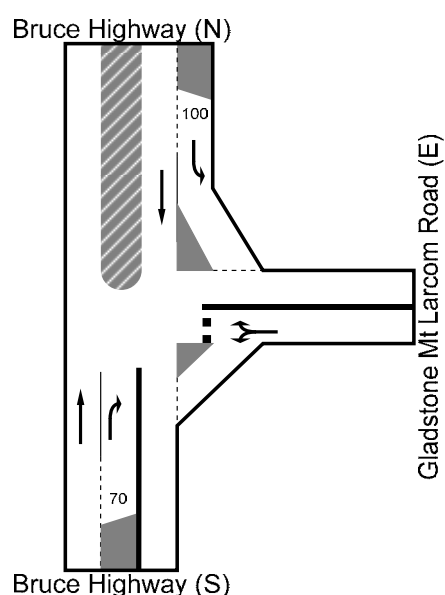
Existing Bruce Highway/Gladstone-Mt Larcom Road intersection
